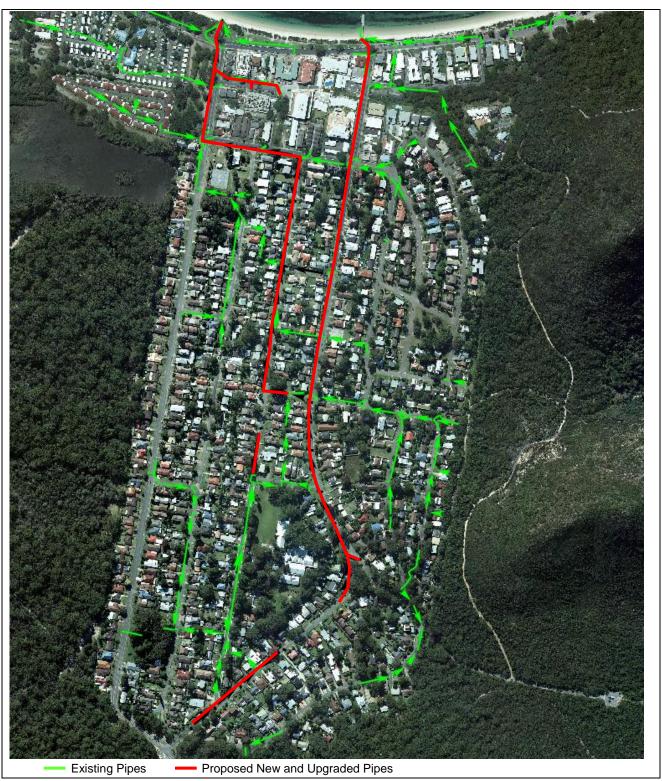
Proposed Option 3 Stormwater Upgrades
